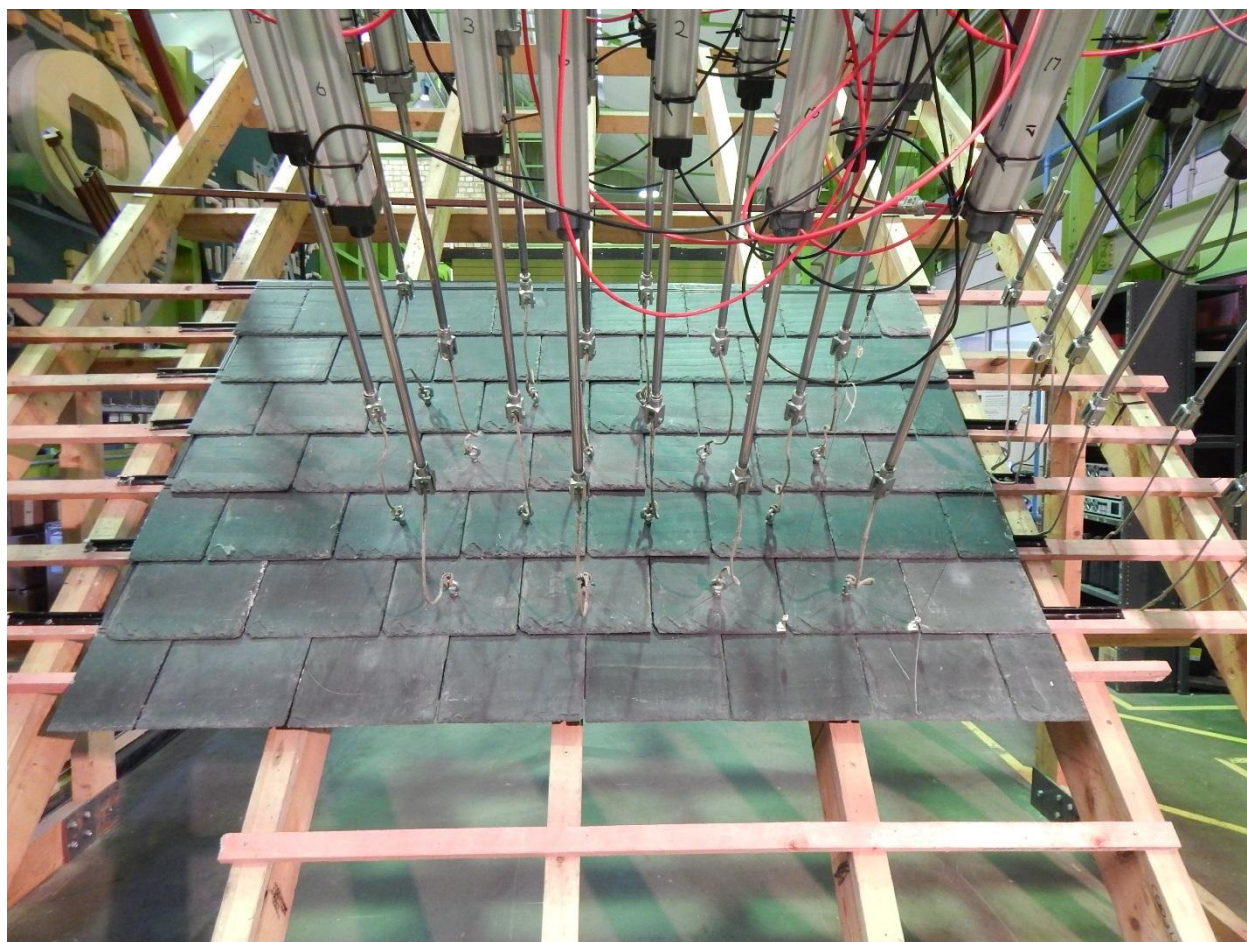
General view of the BRE test rig with the Carapace Slates installed
